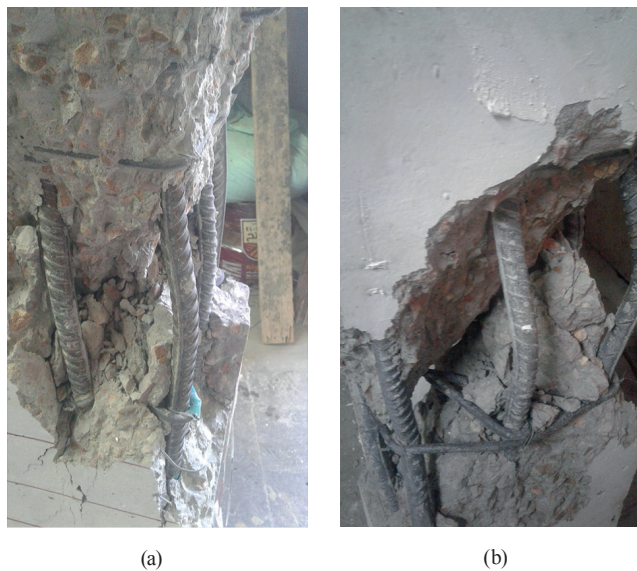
Effectiveness of V-ties in preventing the buckling of longitudinal reinforcing bars: (a) corner longitudinal bars specimen CV-10.5; (b) middle longitudinal bars specimen COV-10.5
